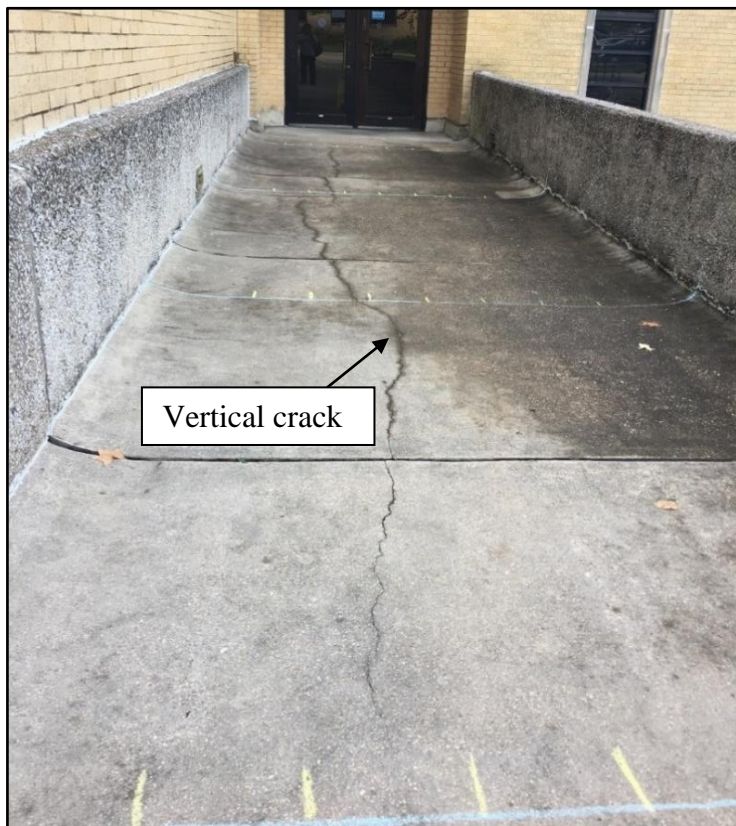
Vertical cracking along the top surface of the bridge deck.
